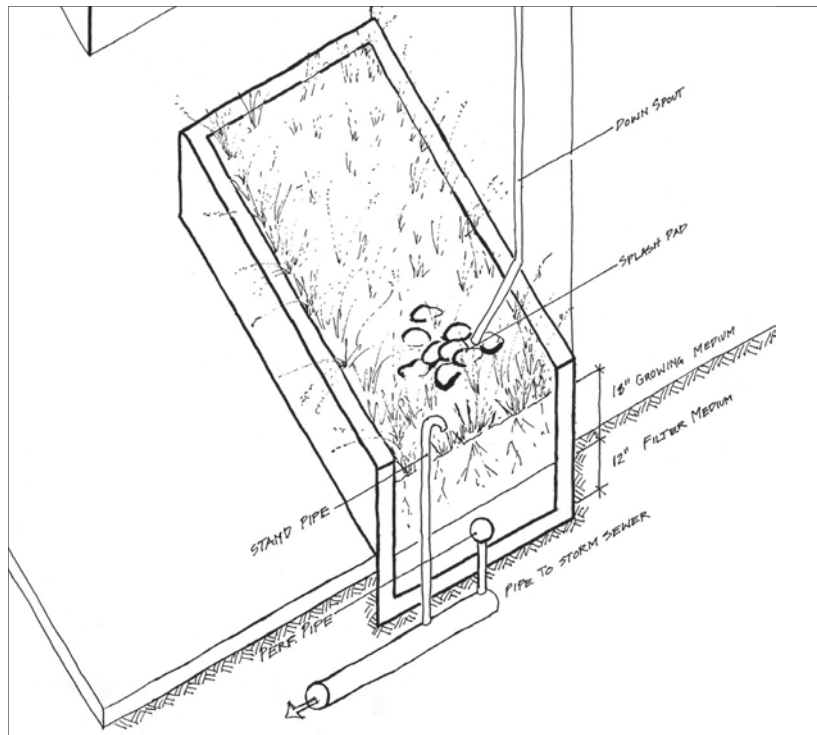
Bio-retention planters can be raised (as shown above) or at-grade to create containerized rain-gardens.
